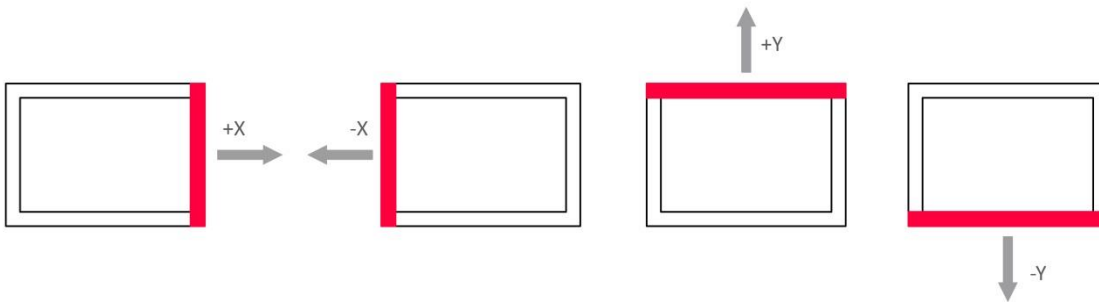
Wall to consider according to the loading direction evaluated (plan view)
